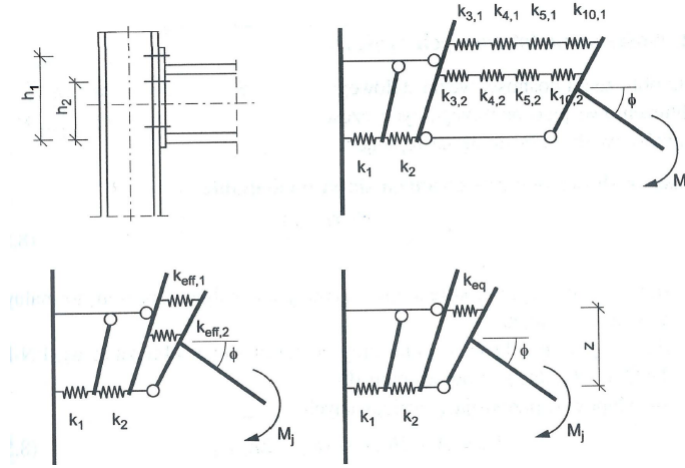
Spring model for multi bolt-rows end-plate joints, ([31])
